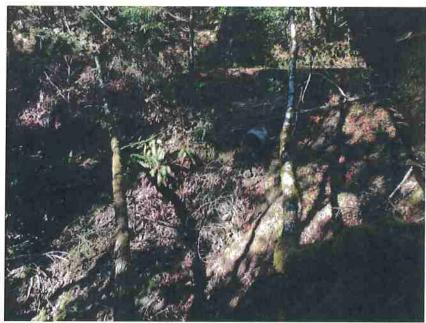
Stream Crossing #3, view of culvert outlet placed high in the fill with 3-4 feet of barrel projection. Culvert is set nearly to the natural grade of the stream channel, and outlets water onto rock armor before plunging approximately 4 foot below to re-enter channel.
